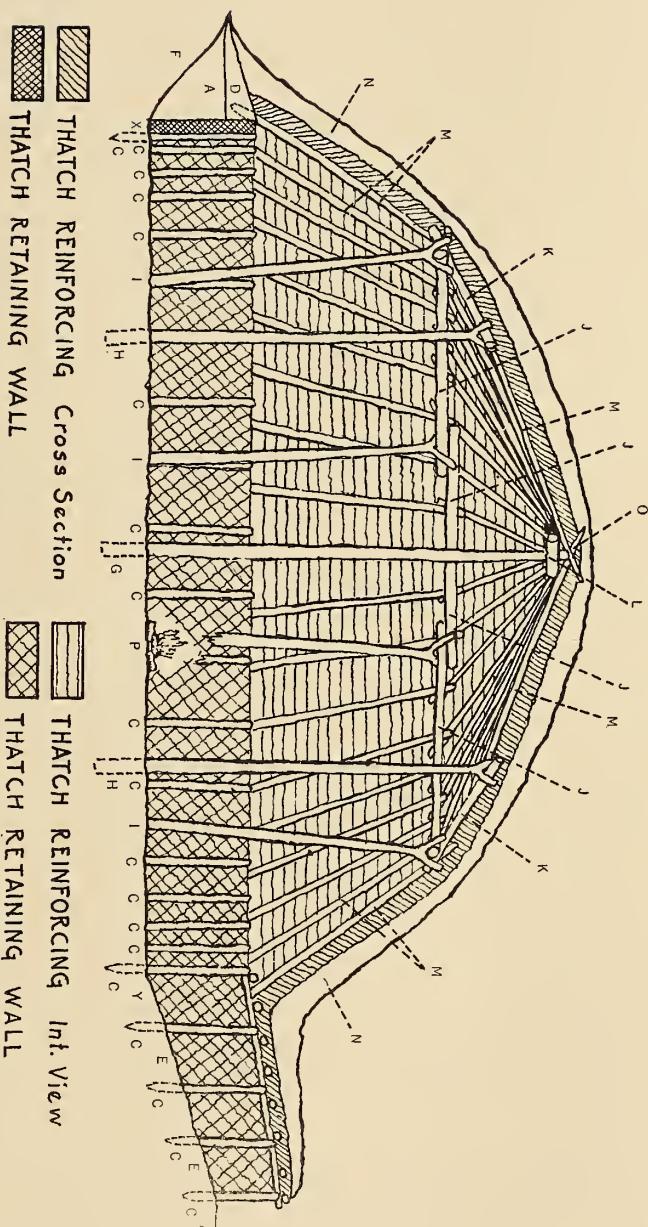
Vertical cross-section of the dance house. A. Exterior ground level. C. Retaining wall posts, *yainwē't*. D. Artificial embankment on exterior exposure of retaining wall. E. Sloping floor of main entrance. F. Sloping floor of back entrance. G. Center house post, *se'kən*. H. Front and rear perpendicular house posts, *to'u*. I. Four house posts on the north side, *po'bī*. J. Stringers on north side of house, *po'bī*. K. Stringers arching east and west ends of house, *po'bī*. L. Shoulders at near-top of center post. M. Rafters, *wayn*. N. Cross-section of earth surfacing. O. Clustered and tied ends of upper elements of rafters. P. Fireplace, *po*. X-Y. Floor level of pit.
